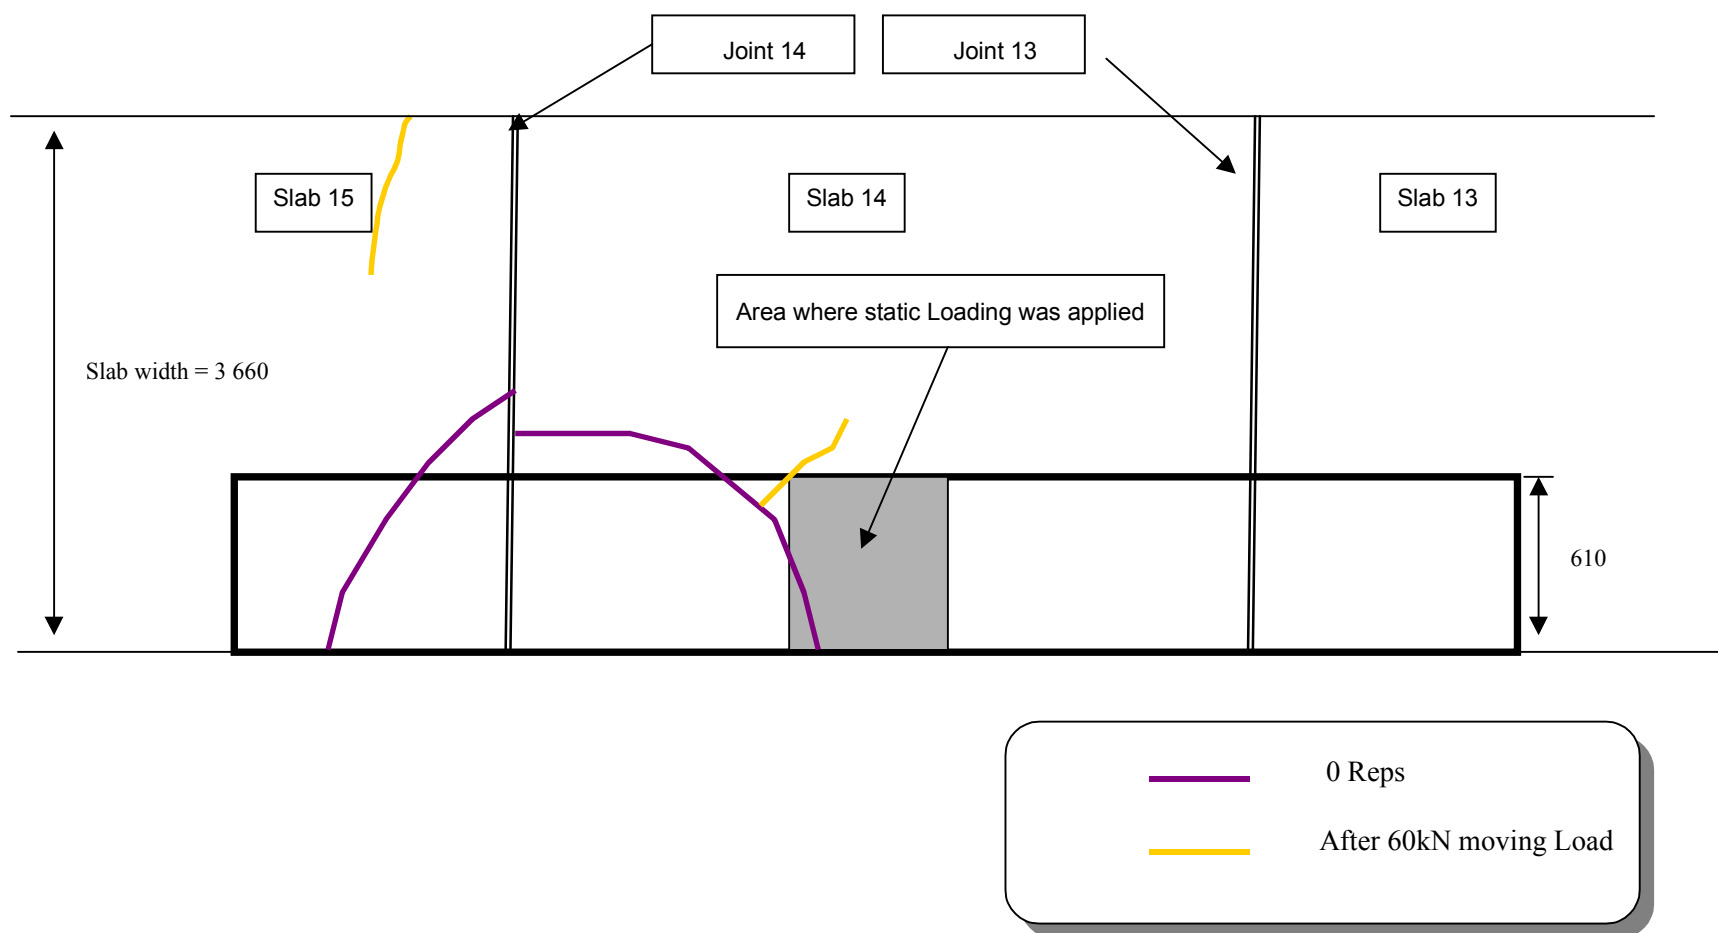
Schematic of crack development, Test Section 522FD (not to scale).
